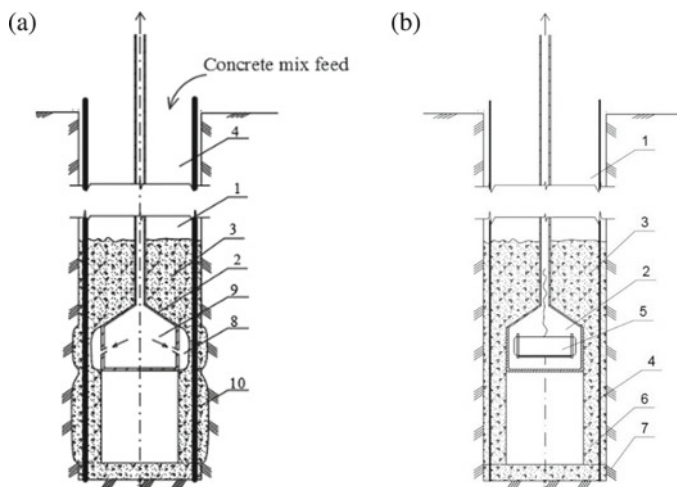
Construction of a bored pile shell: a using an elastic shell and pressing the walls of the well into the ground; b using vibrating concrete mixture; 1—well; 2—core-shaper; 3—concrete mixture; 4—reinforcement frame; 5—vibrator installed in the core; 6—bored pile shell; 7—adjacent soil; 8—elastic shell; 9—concrete mixture pressed into the ground of the well wall; 10—compressed gas
